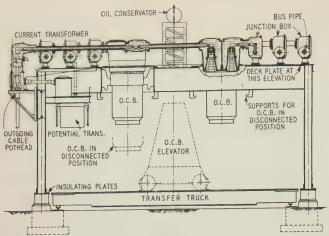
Elevation of one bay of unit No. 1 switchgear
